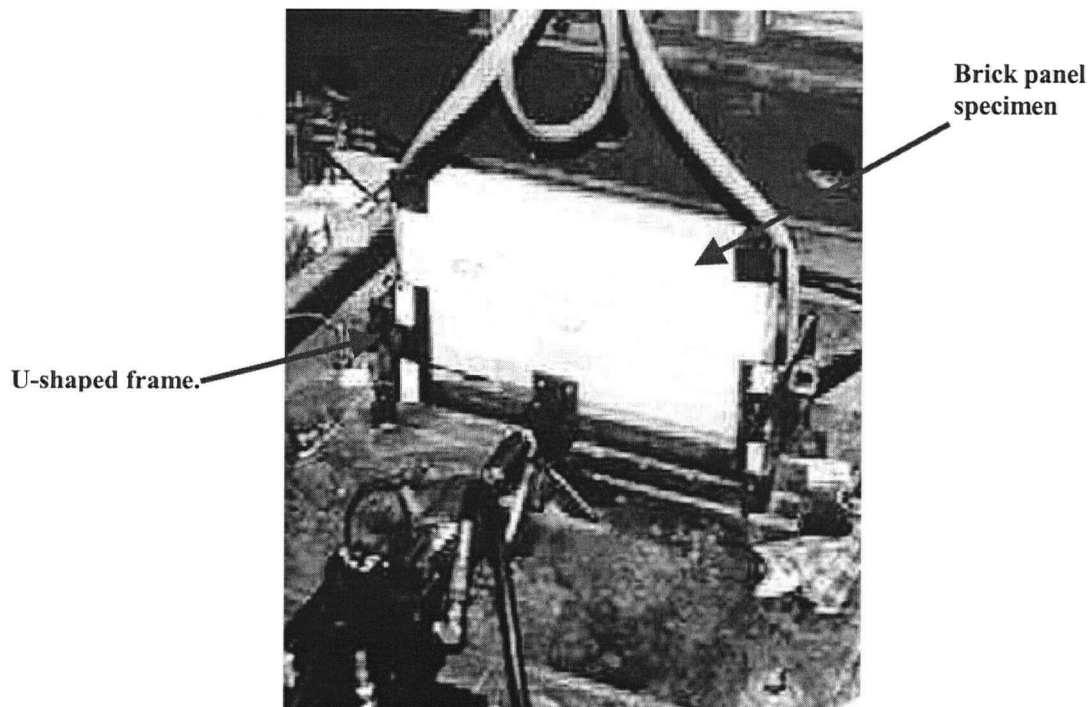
Photograph of installation of a specimen inside the U-shaped frame.
